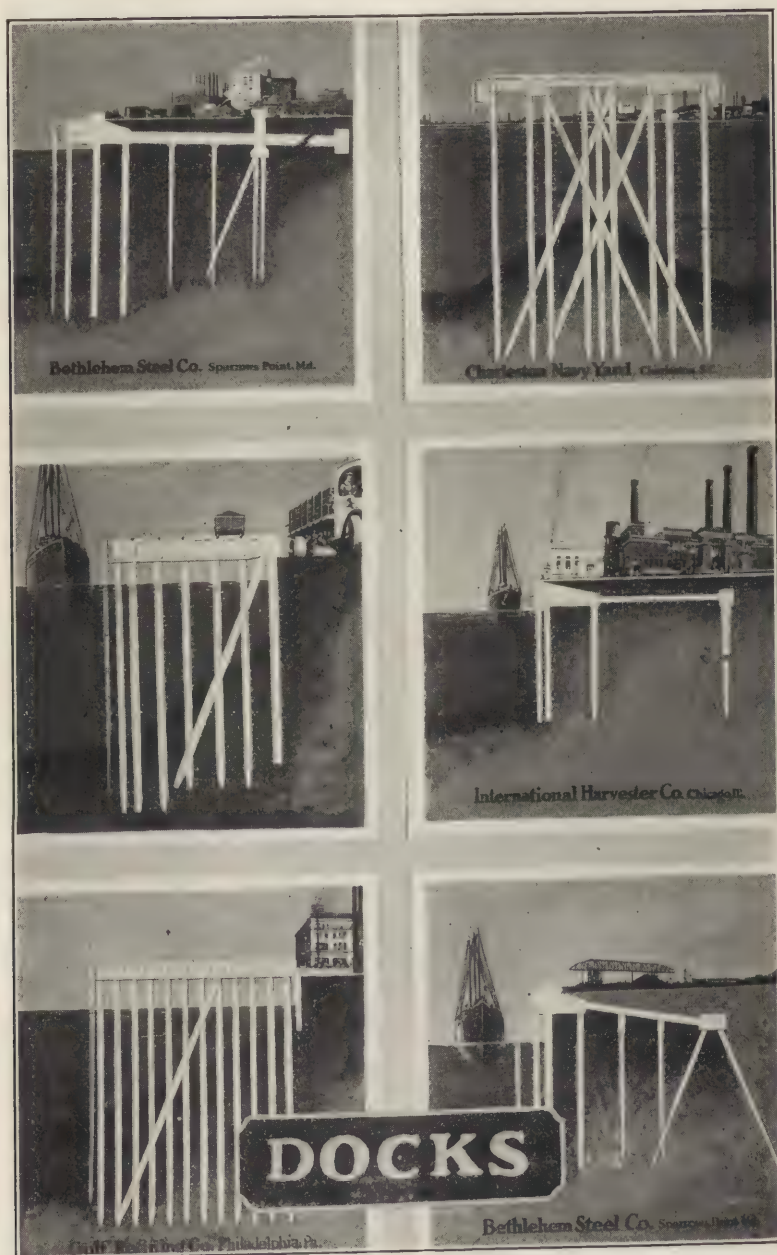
Types of Reinforced Concrete Pile Wharves.
